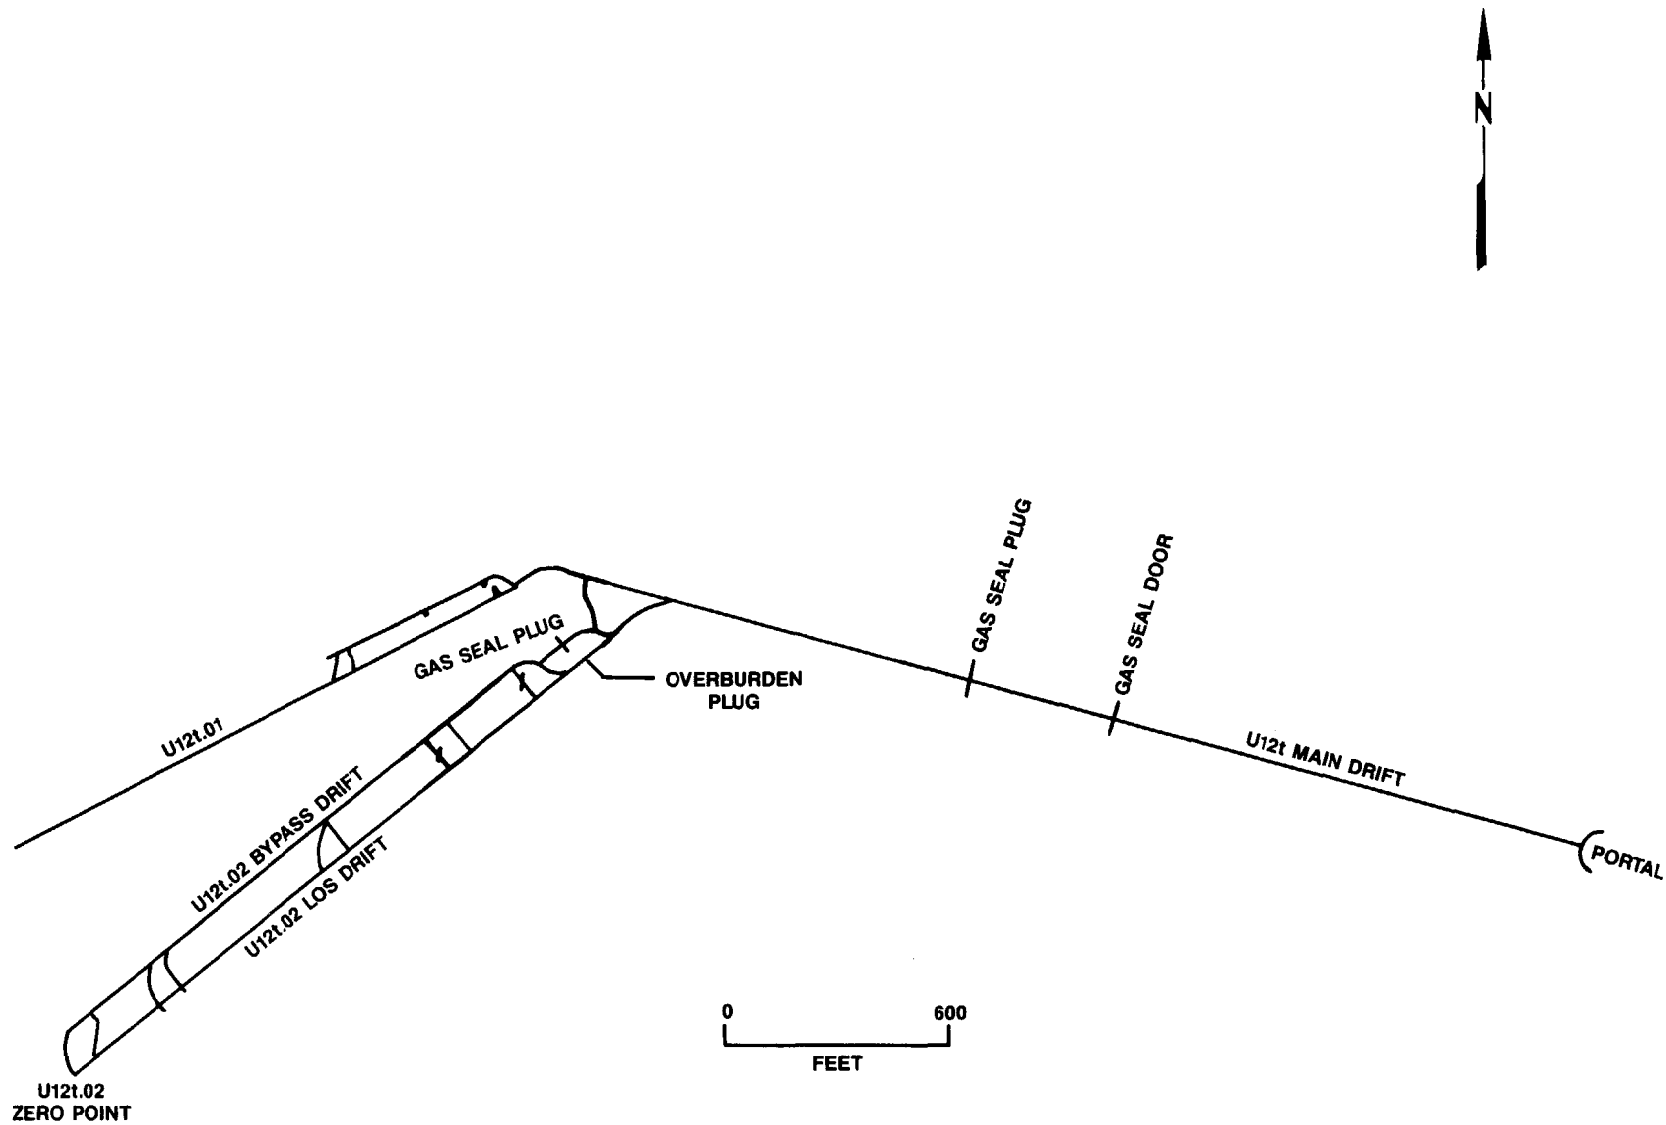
DIAMOND SCULLS Event - Tunnel Layout
